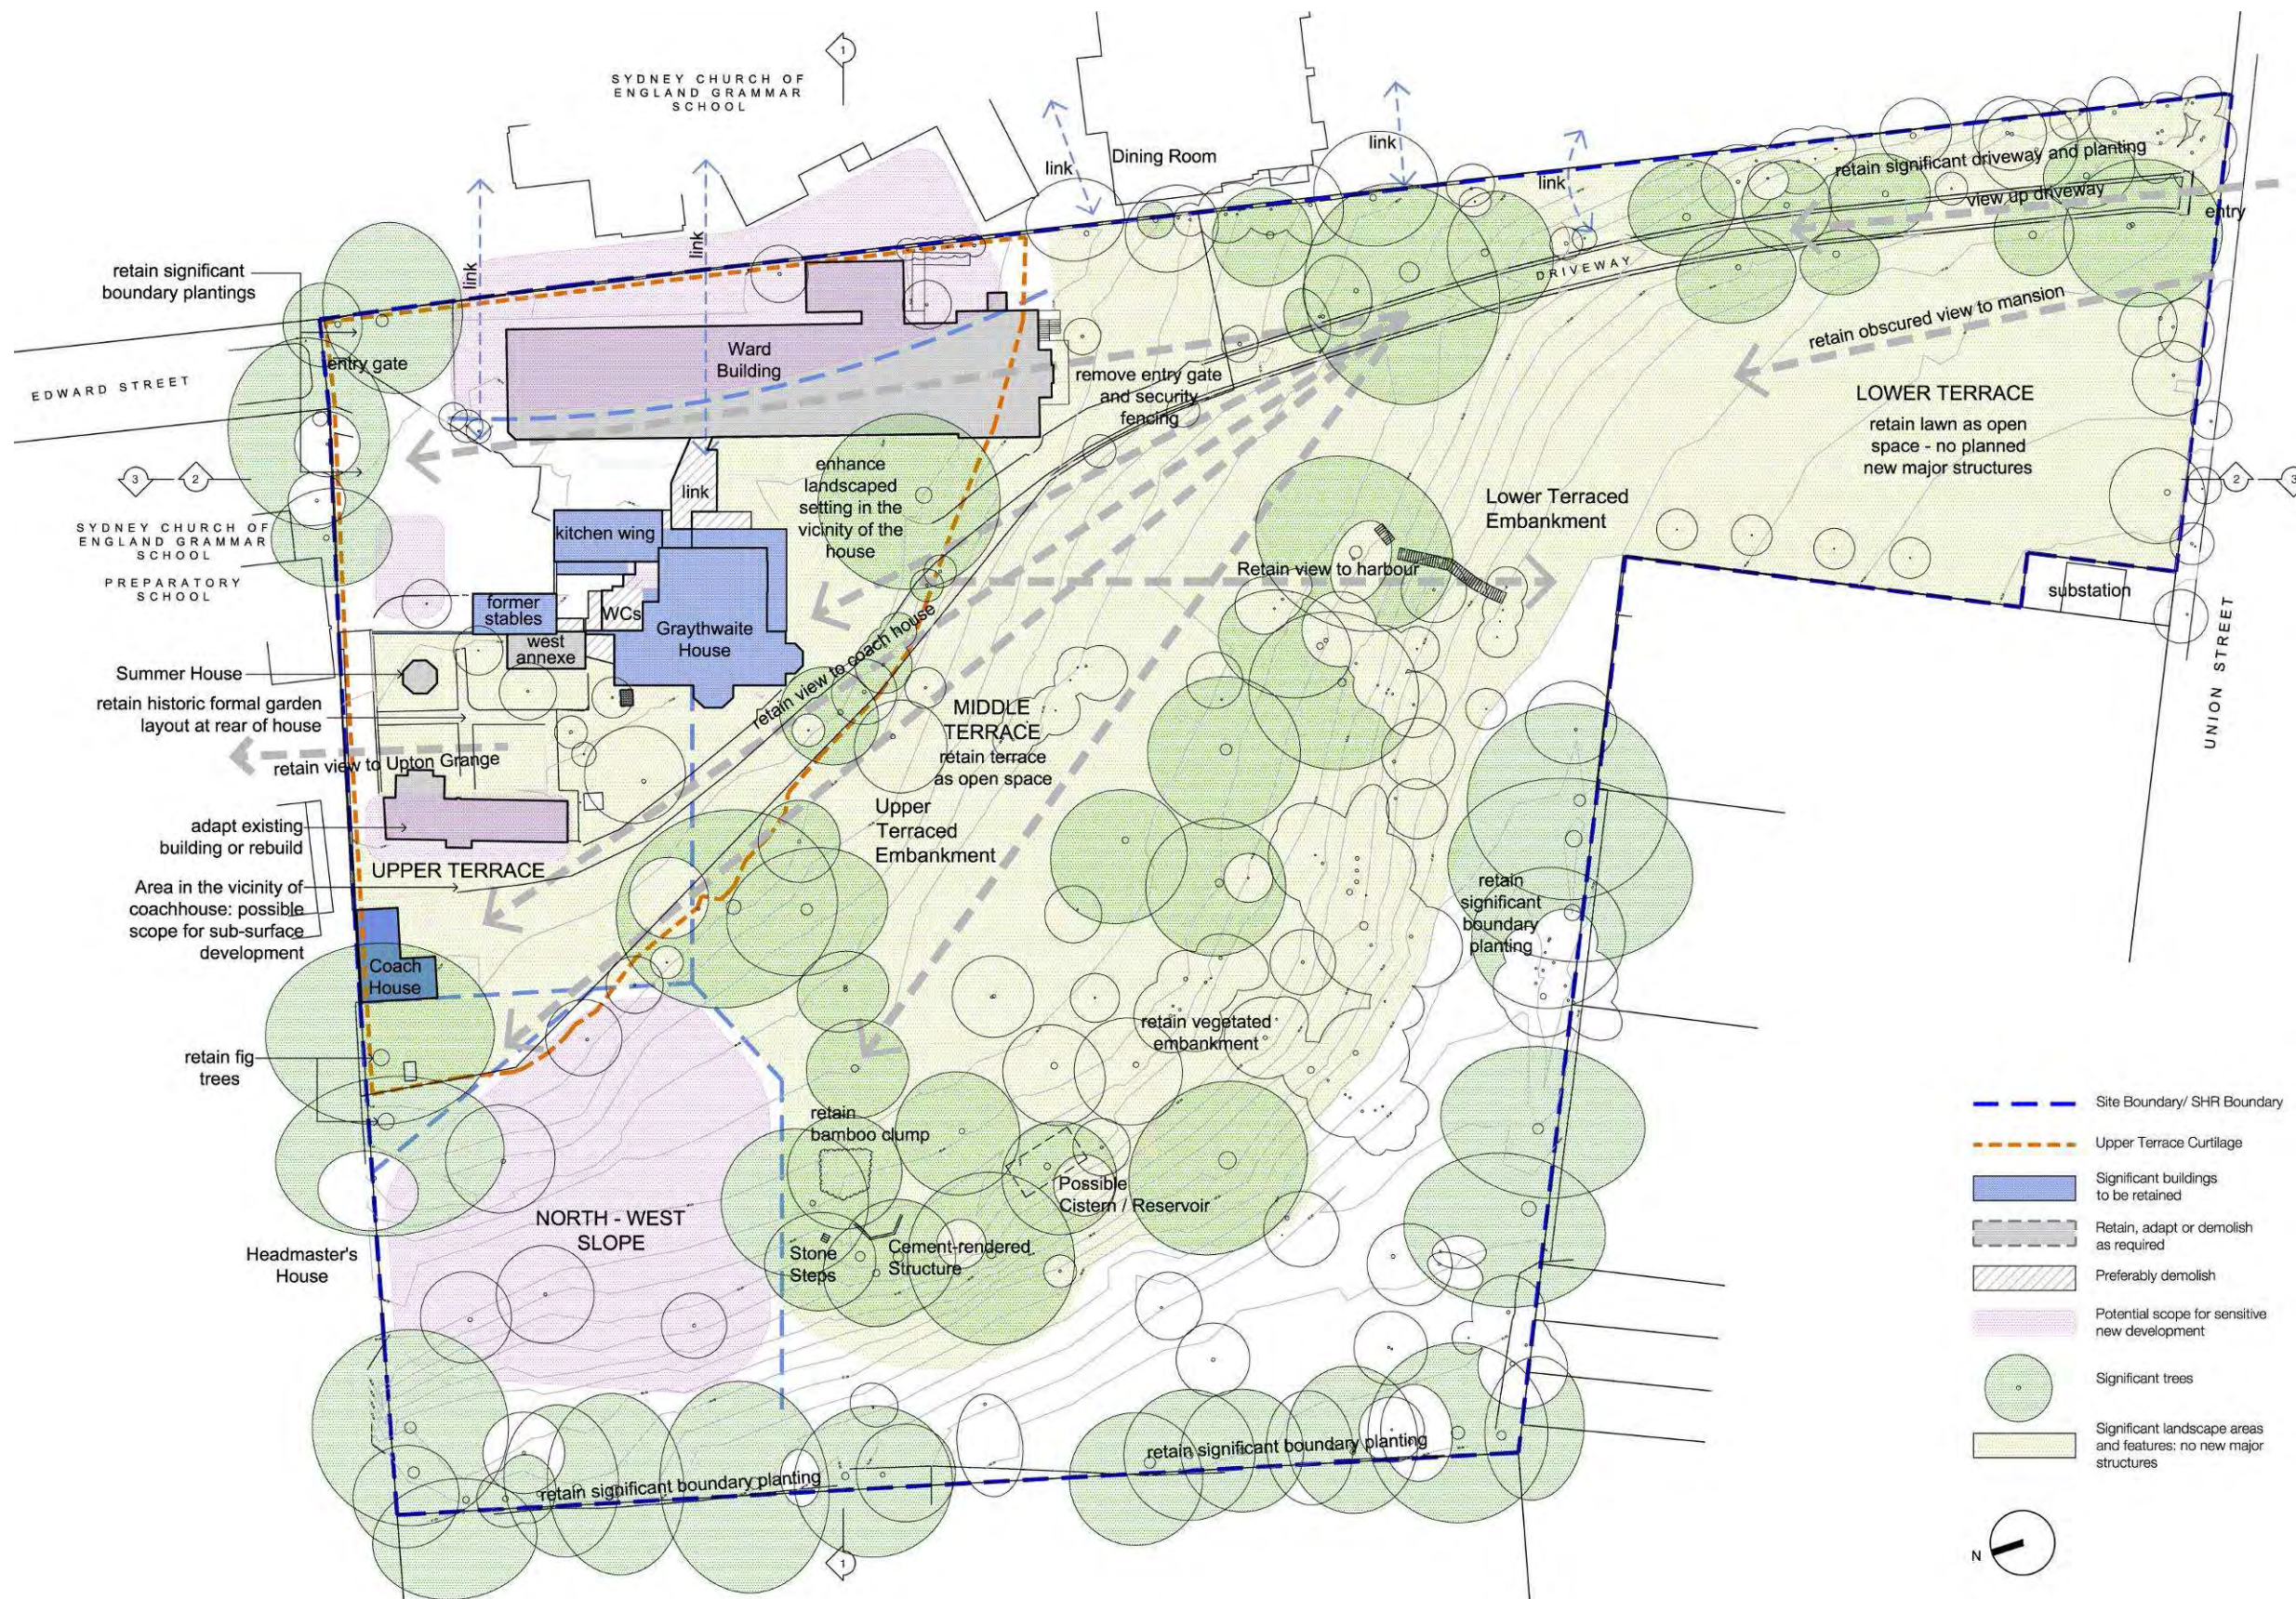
Heritage constraints and opportunities site plan, not to scale.
